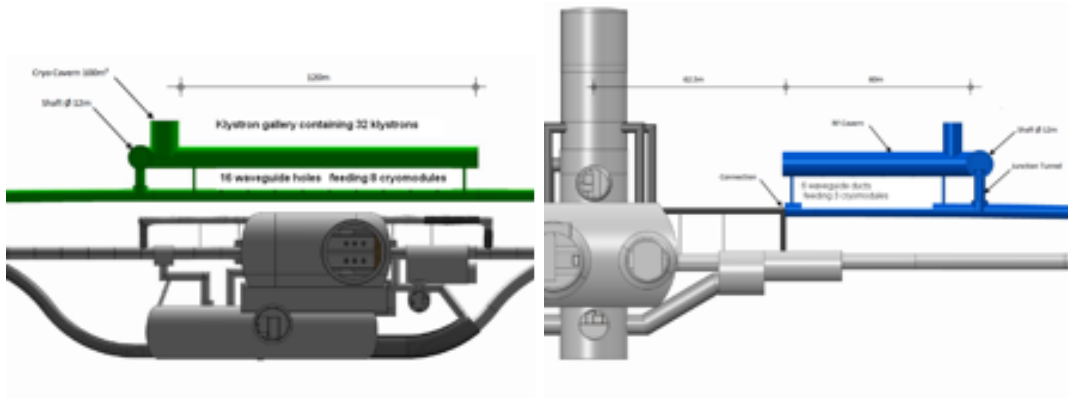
RF tunnel Layouts at CMS and ATLAS bypasses. Note only the right hand side at ATLAS shown.
